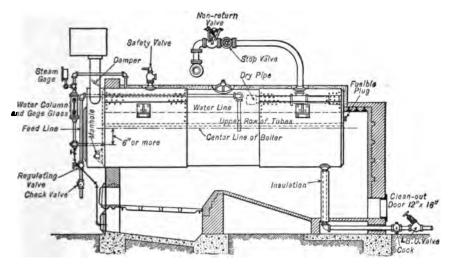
Fittings and Connections for Return Tubular Boilers.
